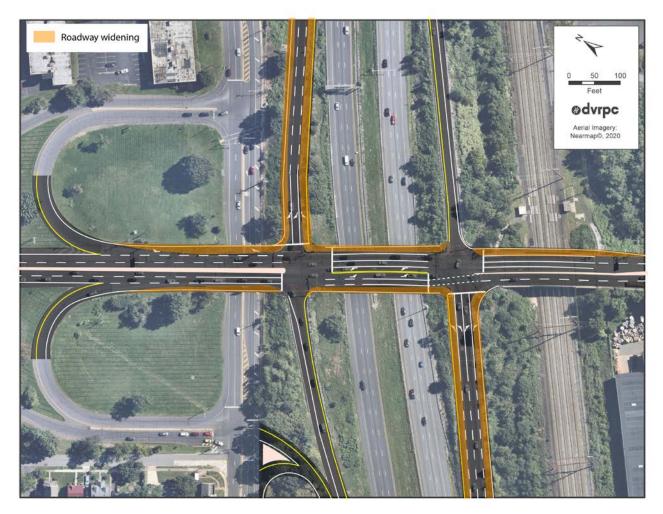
Roadway Configuration, Street Road and I-95 Intersections, Future Year (2045) + Improvements Alternative A
